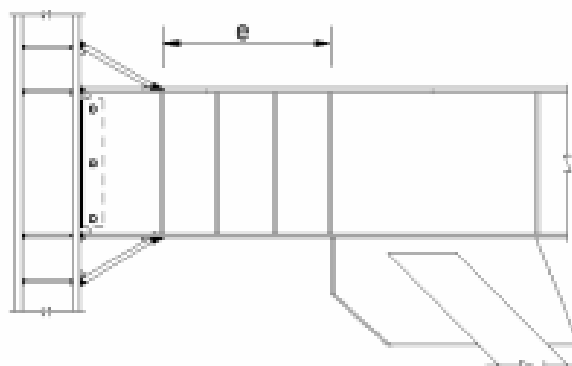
Example of a reinforced link-to-column connection.
